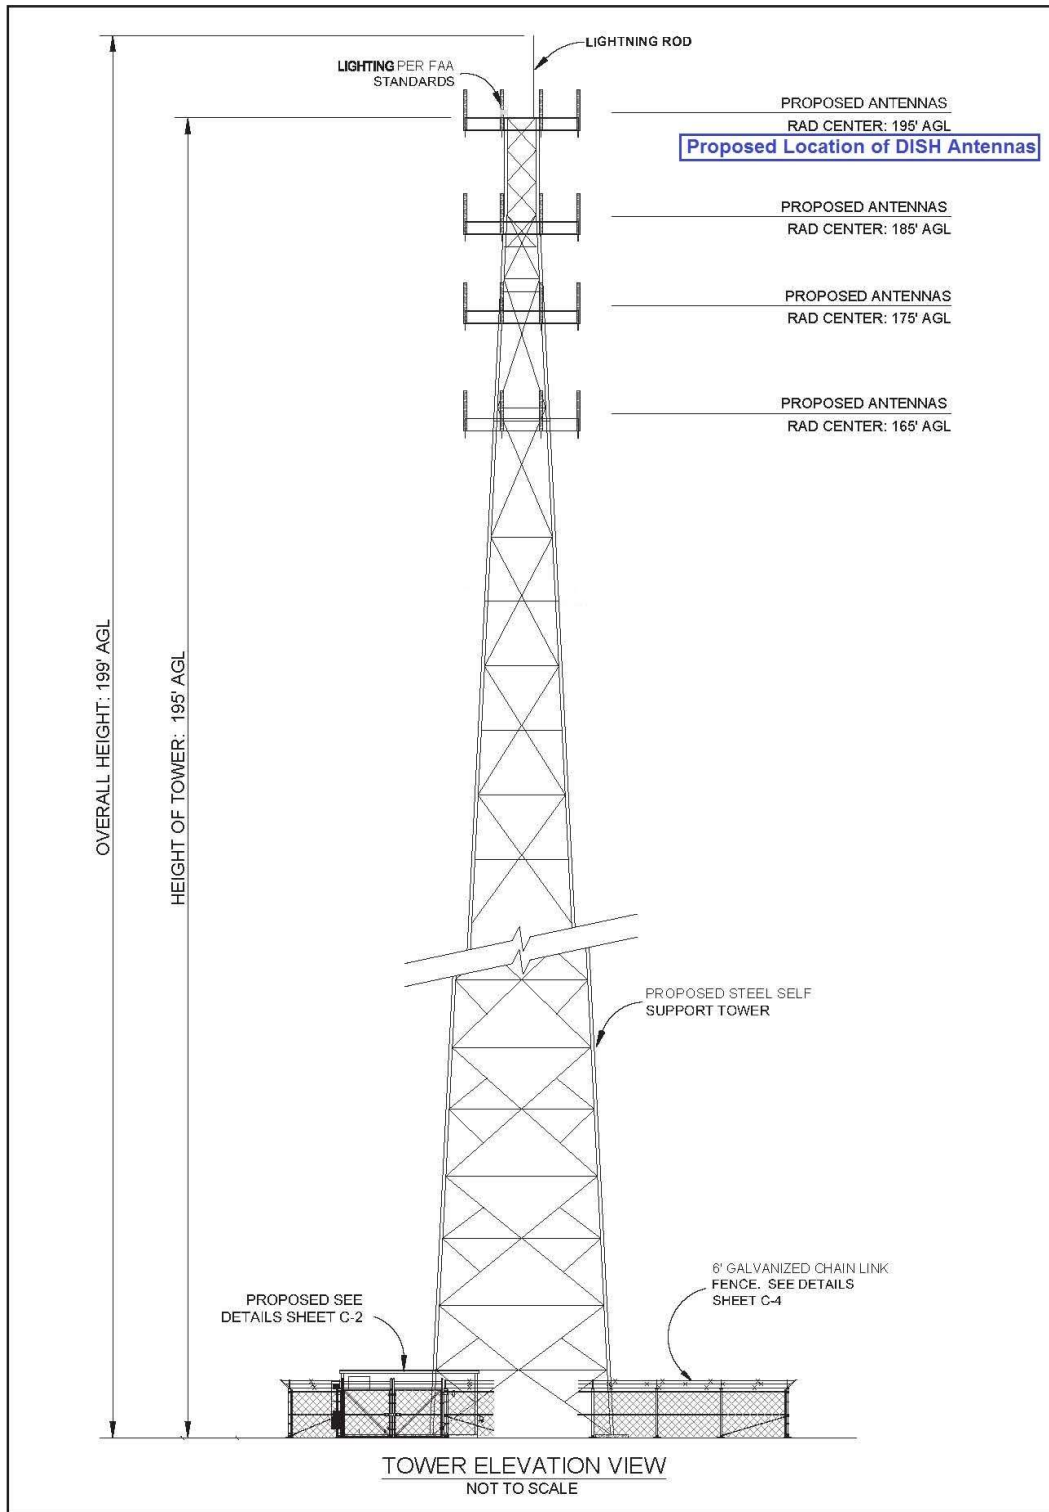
Elevation Tower Sketch (with added note by CityScape in Blue)
